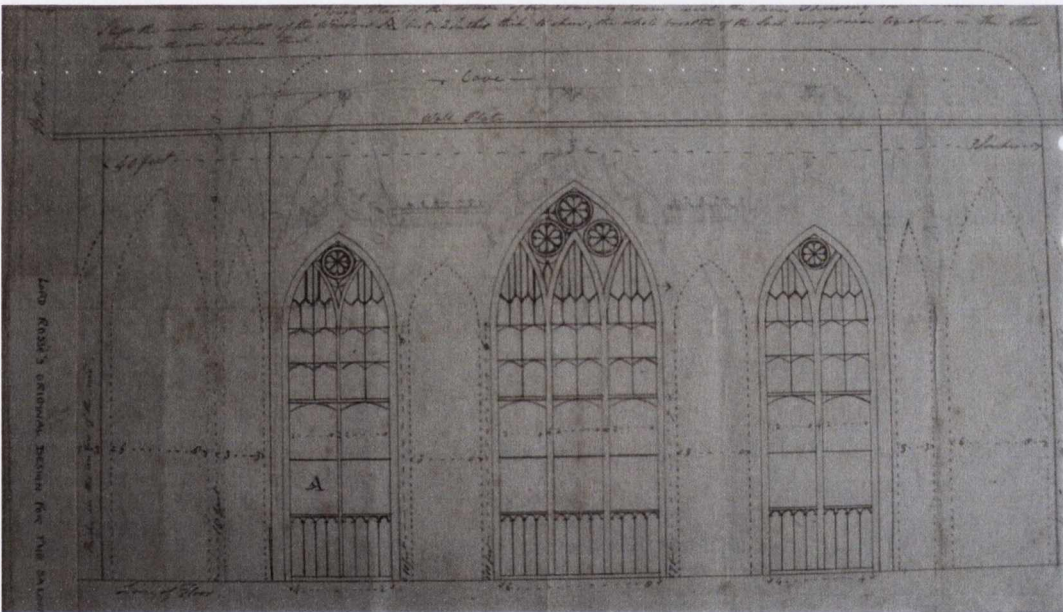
Birr Castle, elevation of window wall in new drawing room, attrib. to John Johnston, [1802–1804], Rosse papers, O/18/14.
